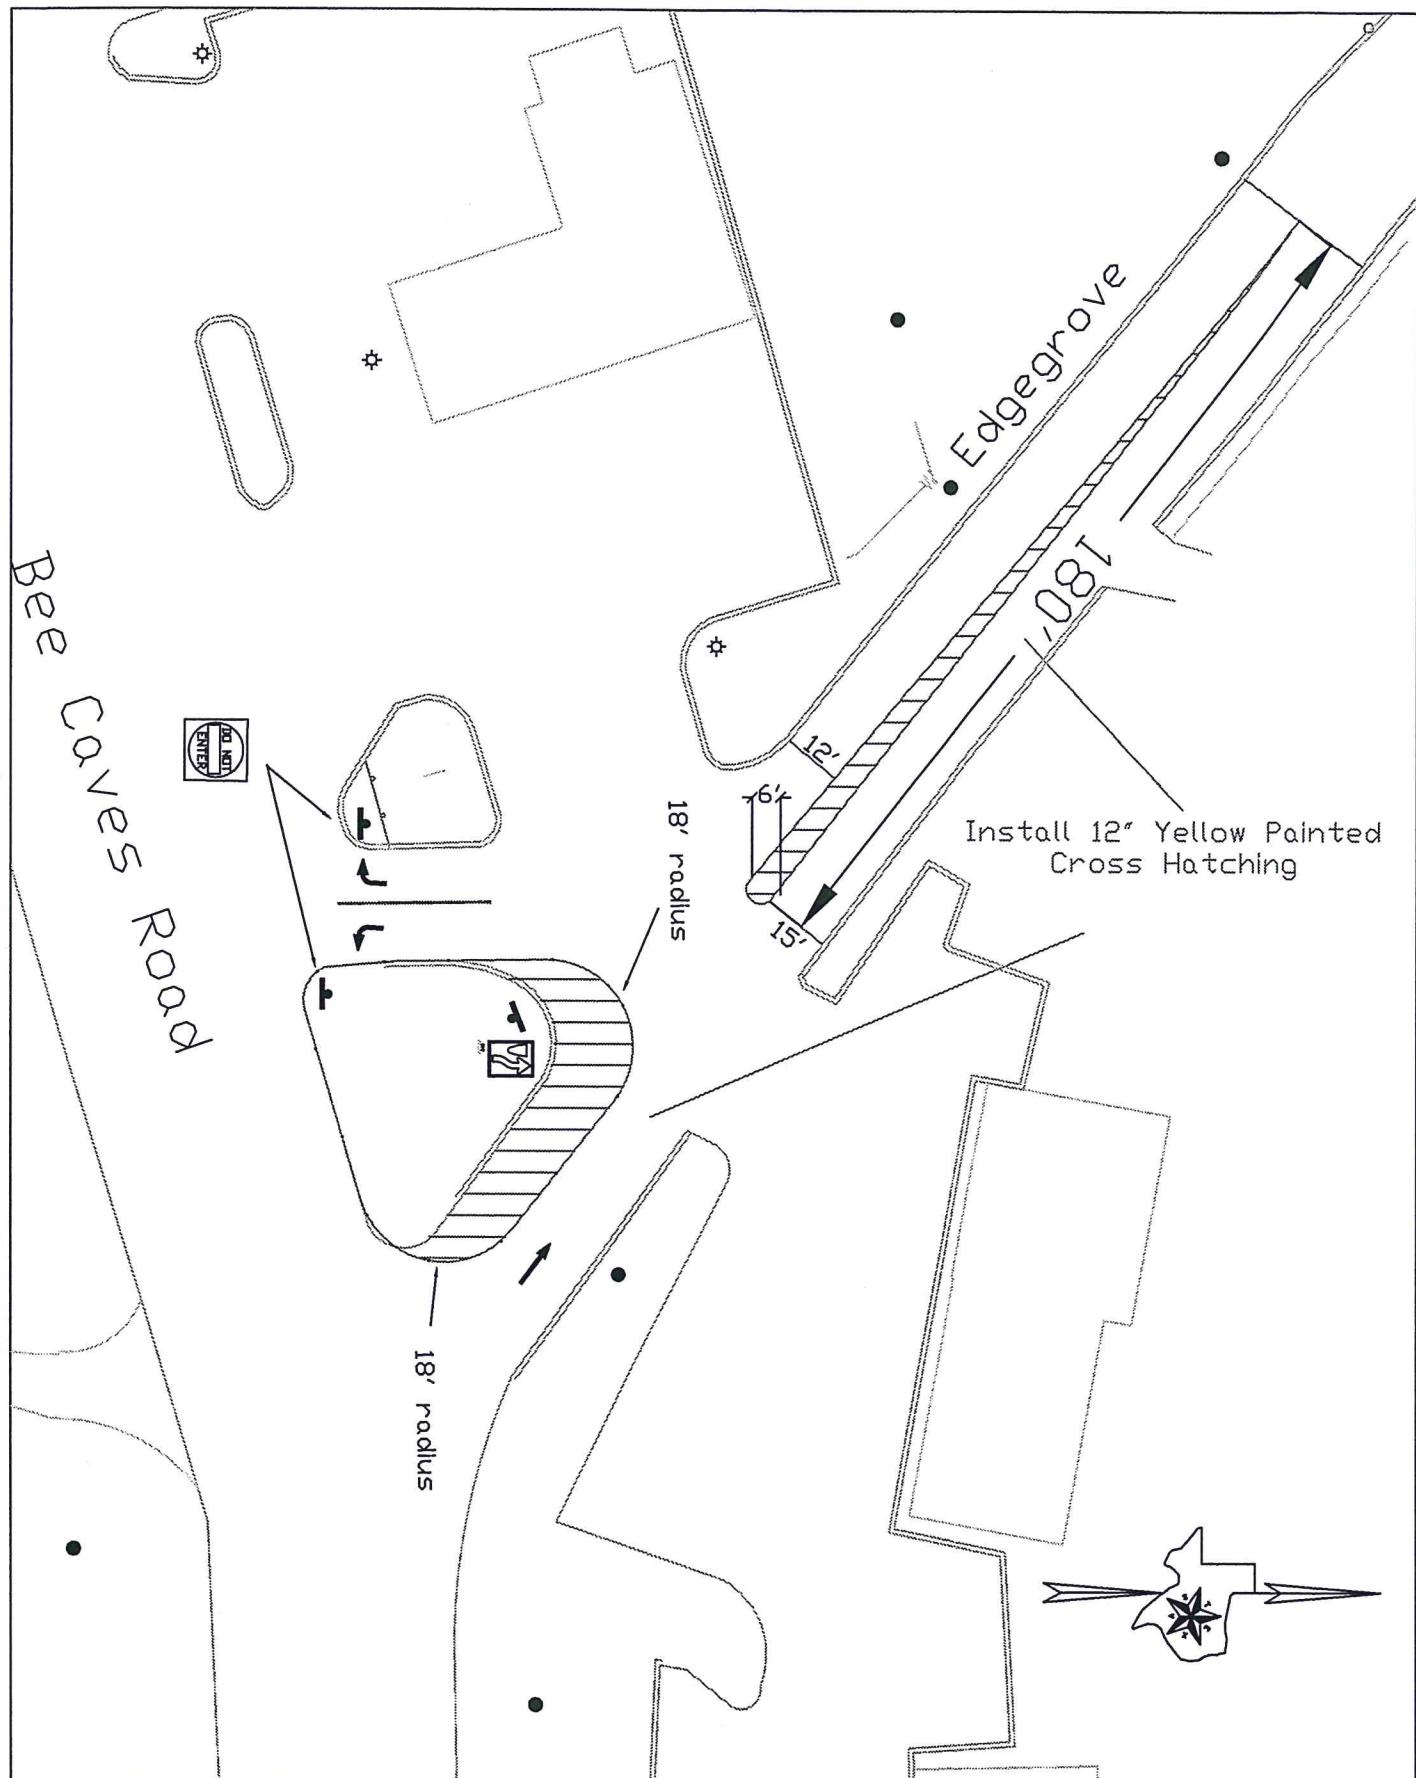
Intersection modifications at Edgegrove and Bee Caves Road
